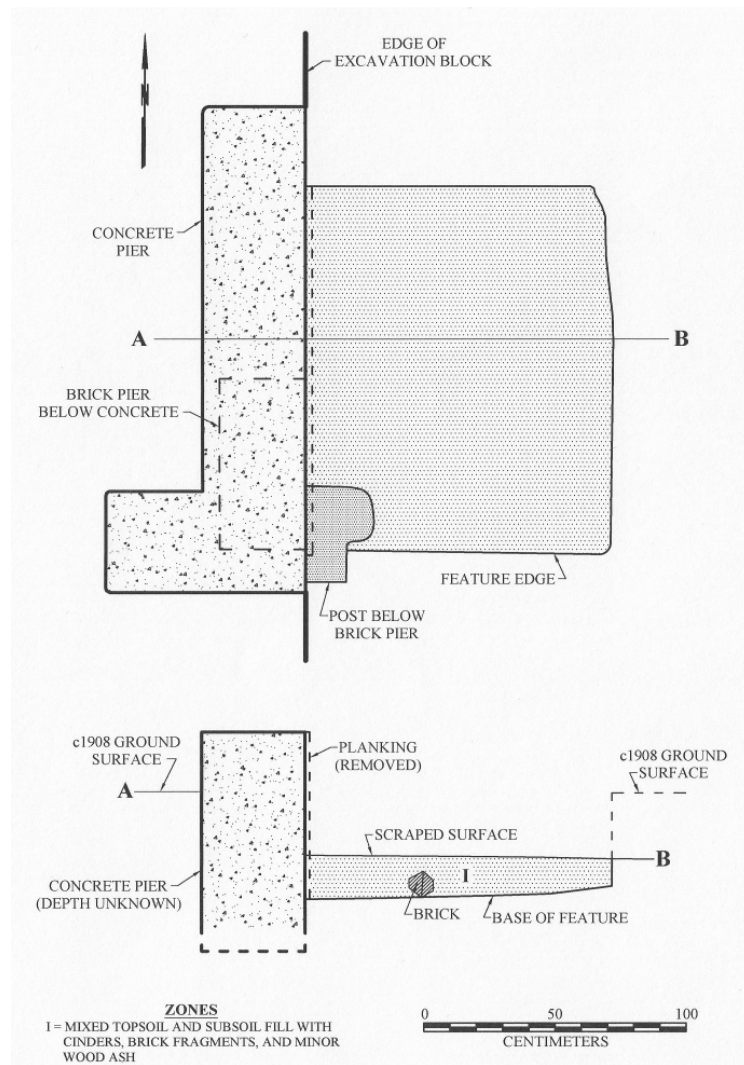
Two views of foundation details, House G (south wall of the front section of the building). Both images depict the original foundation system (with intact chimney support) and the later replacement foundation (associated with the re-located and/or rotated house).
